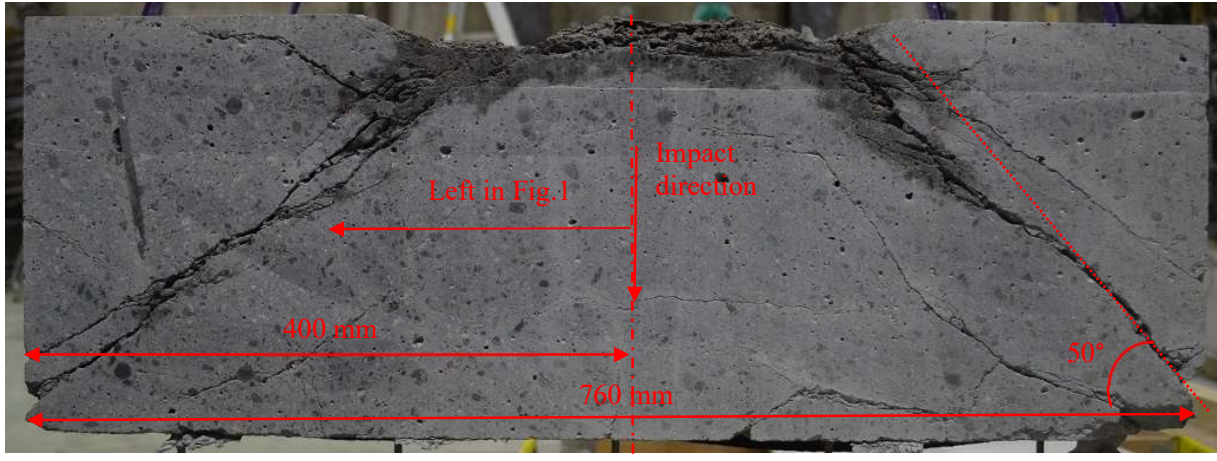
Horizontal cross-section of the impacted wall at the impact height.
